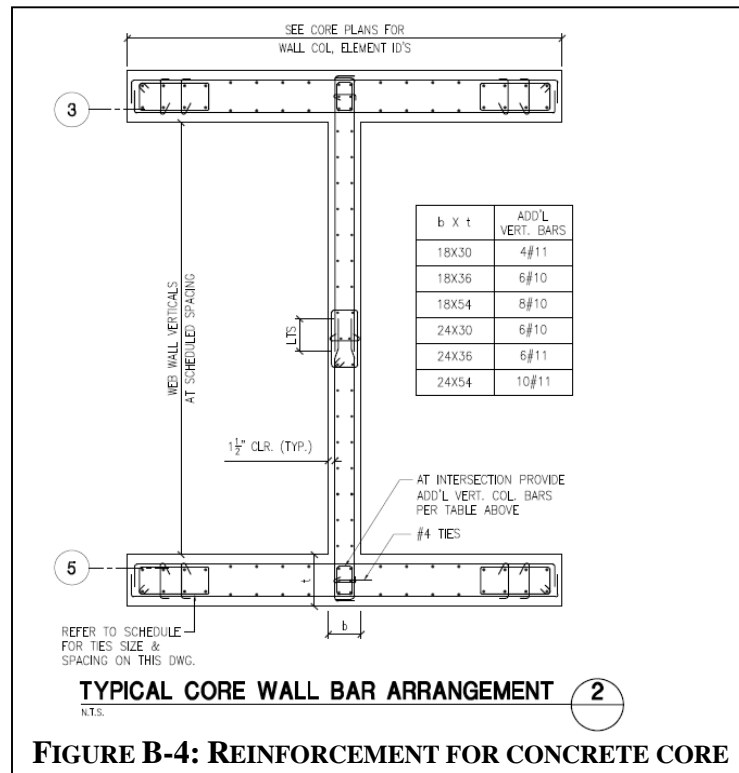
REINFORCEMENT FOR CONCRETE CORE
